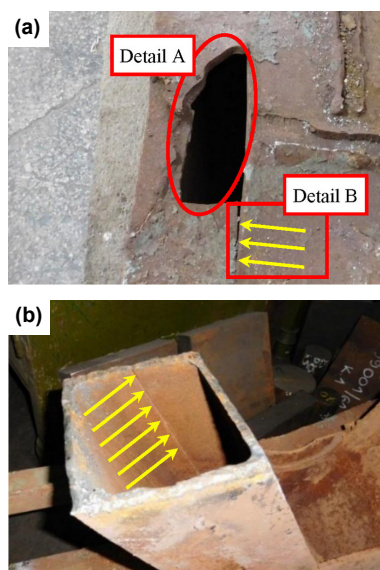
Details of the box girder (2×UPN 160 channel) of the lower truss of the belt conveyor bridge: (a) fracture of the part of the flange and the single butt weld cracking; (b) incomplete root penetration of the single butt weld.
